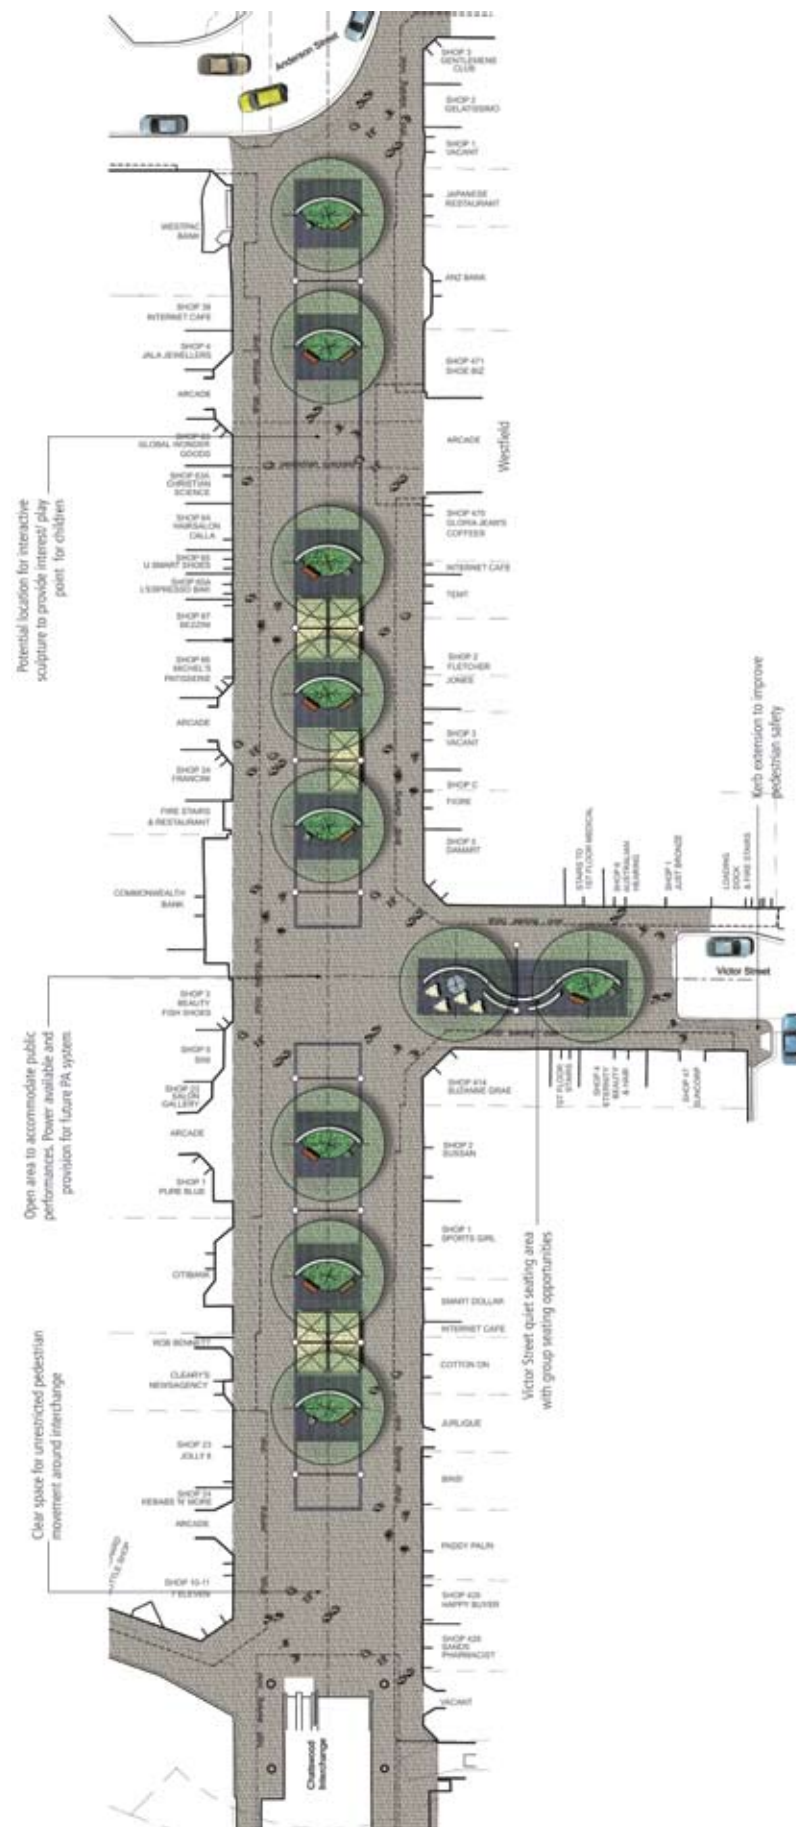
Landscape Plan showing the works being undertaken at Victoria Mall
